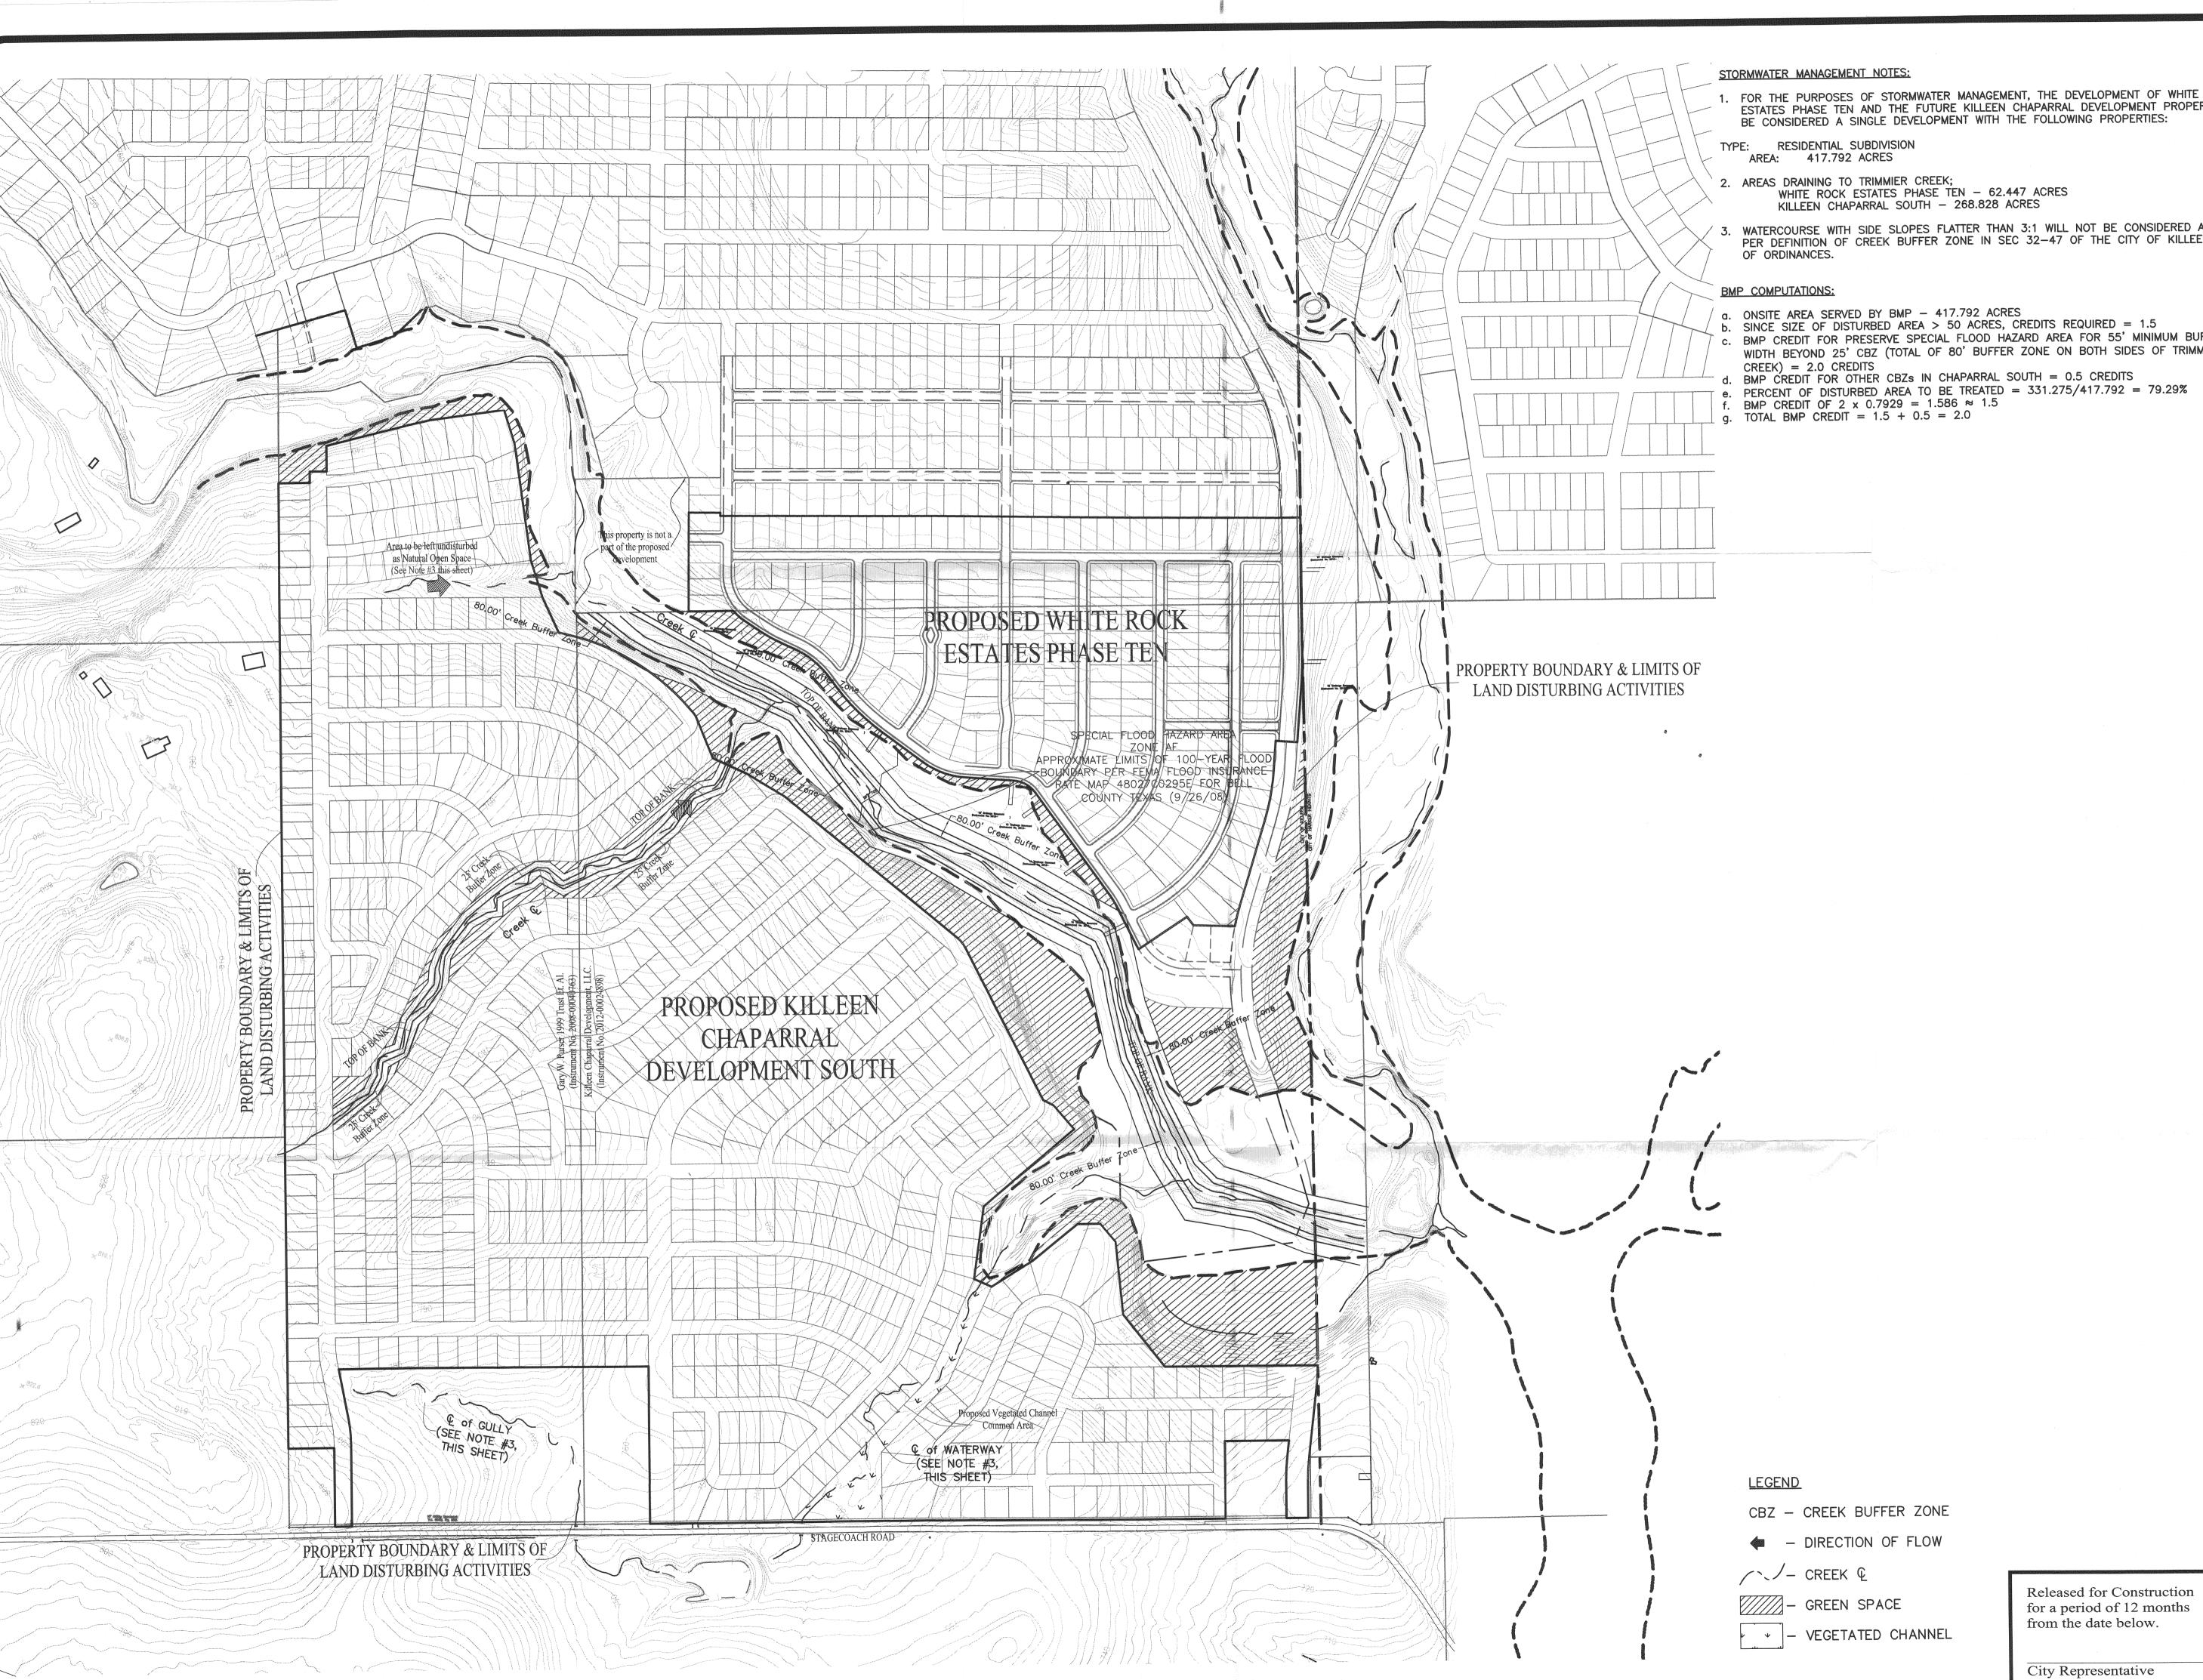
STORM WATER MANAGEMENT SITE PLAN
